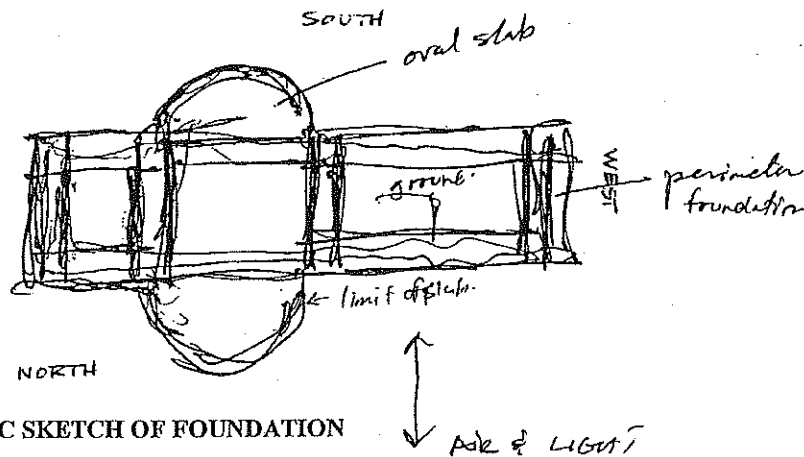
SCHEMATIC SKETCH OF FOUNDATION
